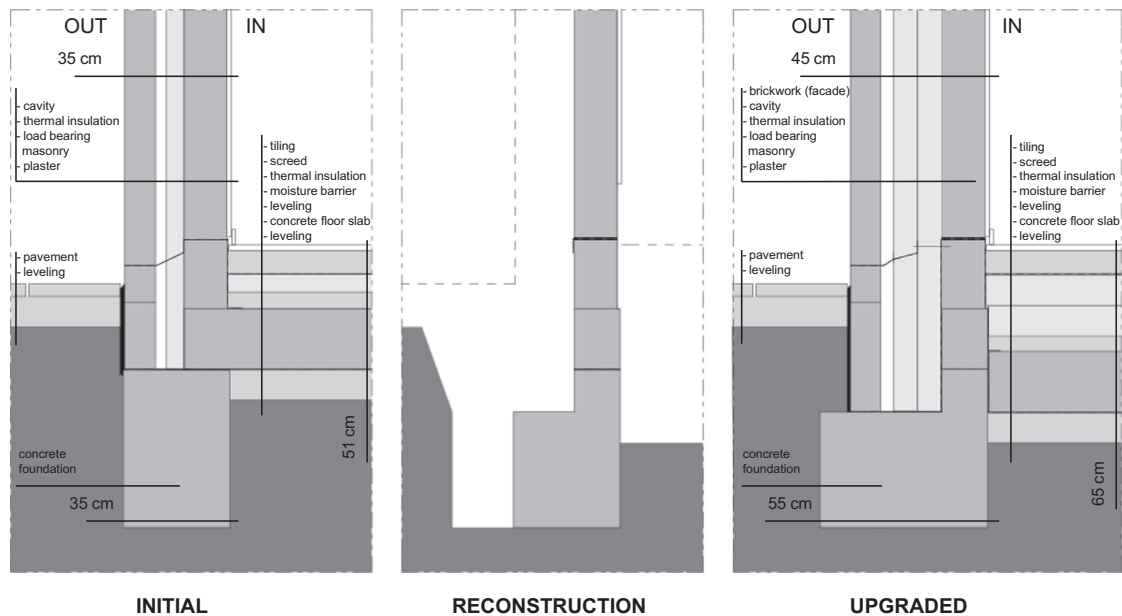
Wall-floor connection detail showing the initial, reconstruction and upgraded phase.
